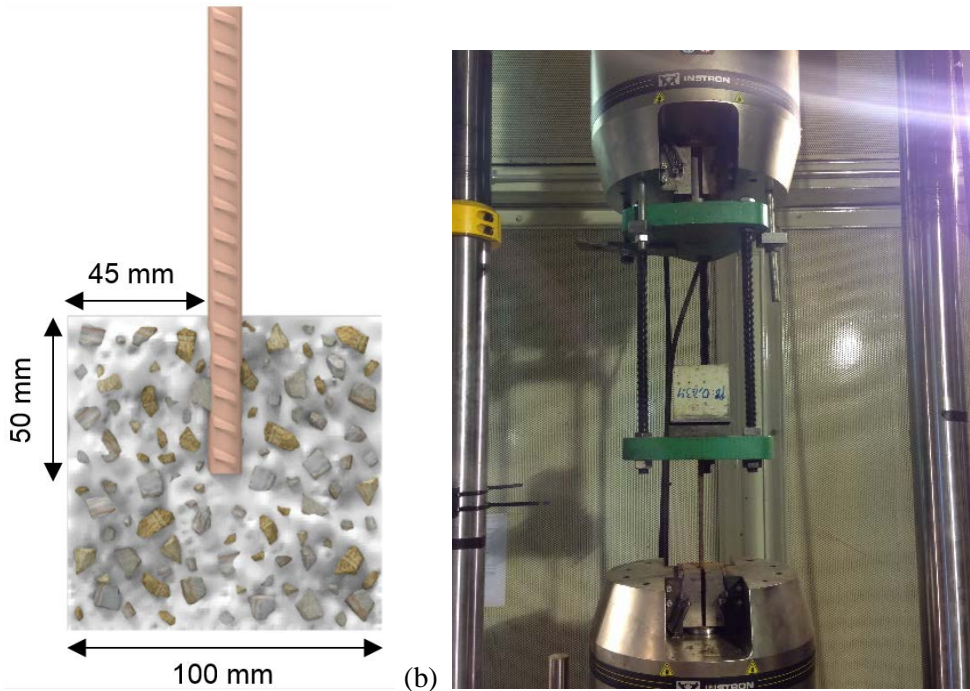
(a) Concrete specimen description (Phase 2) (b) Pull-out test setup
